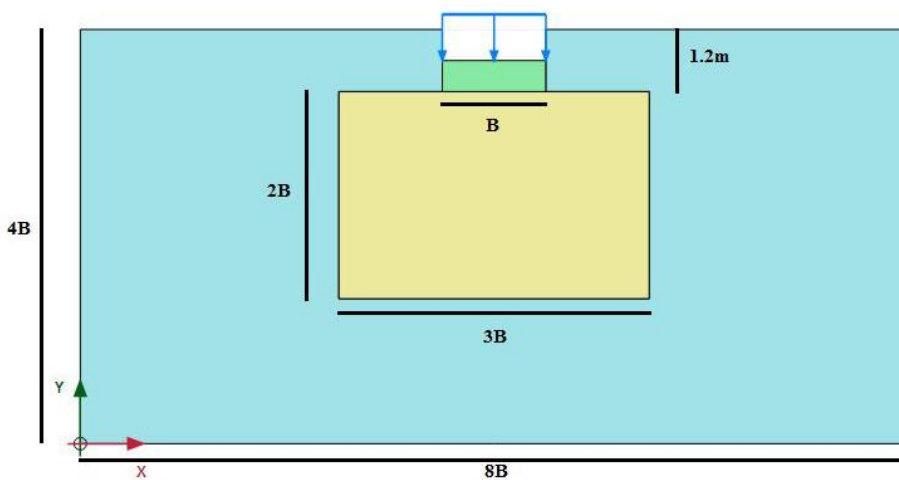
Strip footing resting on stabilized zone of depth 2B and width 3B (Case III)
